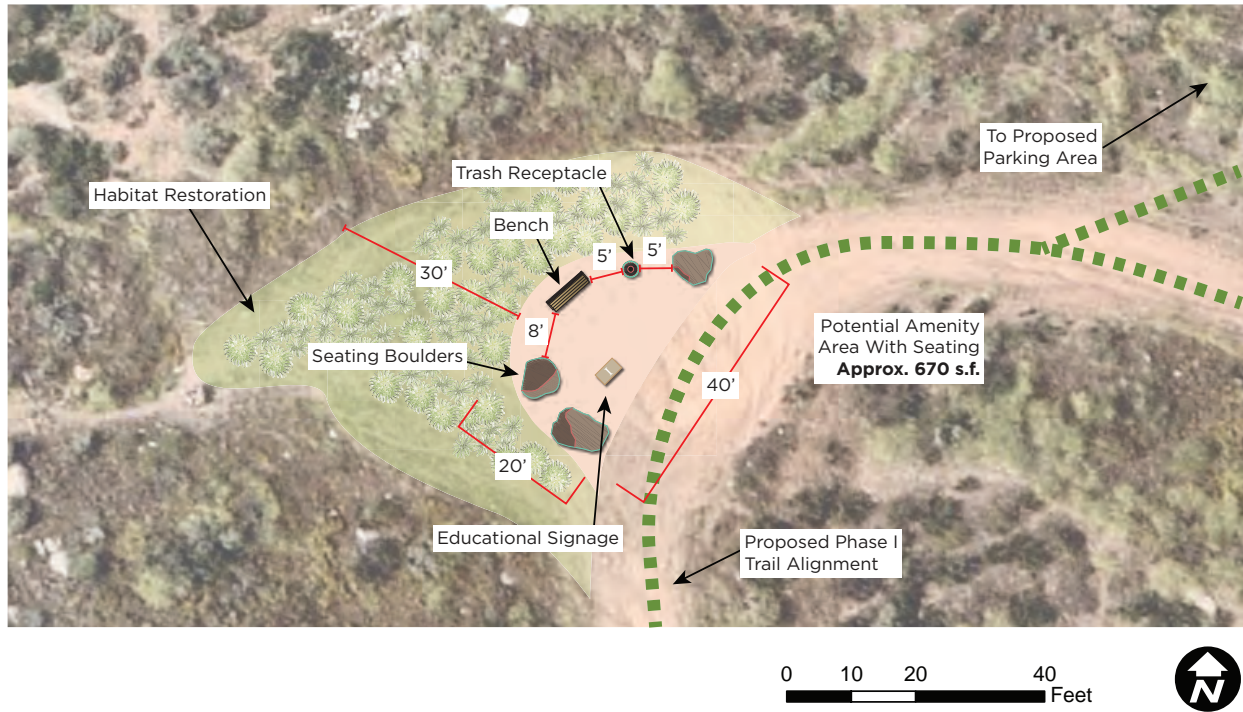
Conceptual layout of proposed trailside seating area at southwest corner of primary trail alignment
